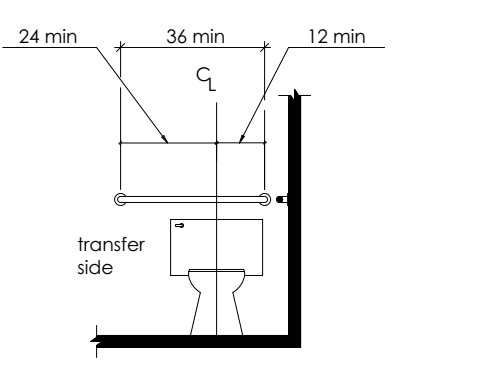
Rear Wall Grab Bar at Water Closets
